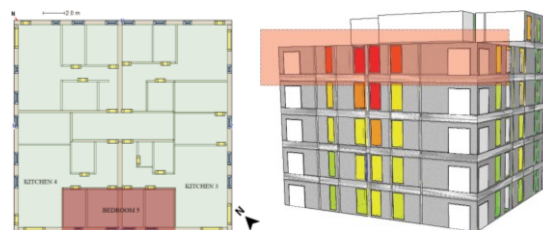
SHOWING KEY PLAN OF THE 5TH FLOOR AREA USED FOR ANALYSIS OF OVERHEATING ISSUE
